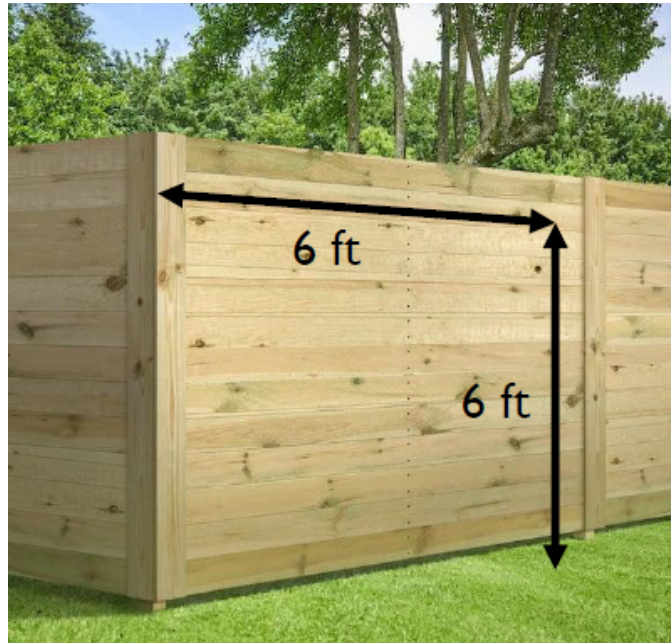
Fence detail showing 6-foot-tall wooden privacy fence.
